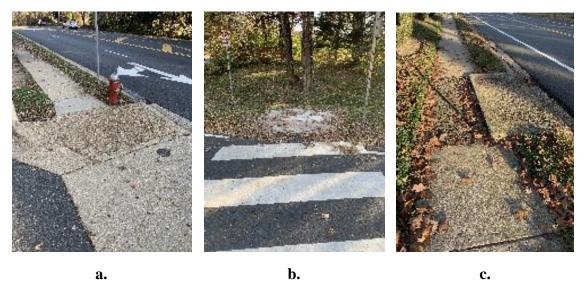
Examples of (a.) Lack of Truncated Dome, (b.) Missing Section/Connection, and (c.) Protruding Object along public right of ways Woodburn Rd and Tobin Rd.
